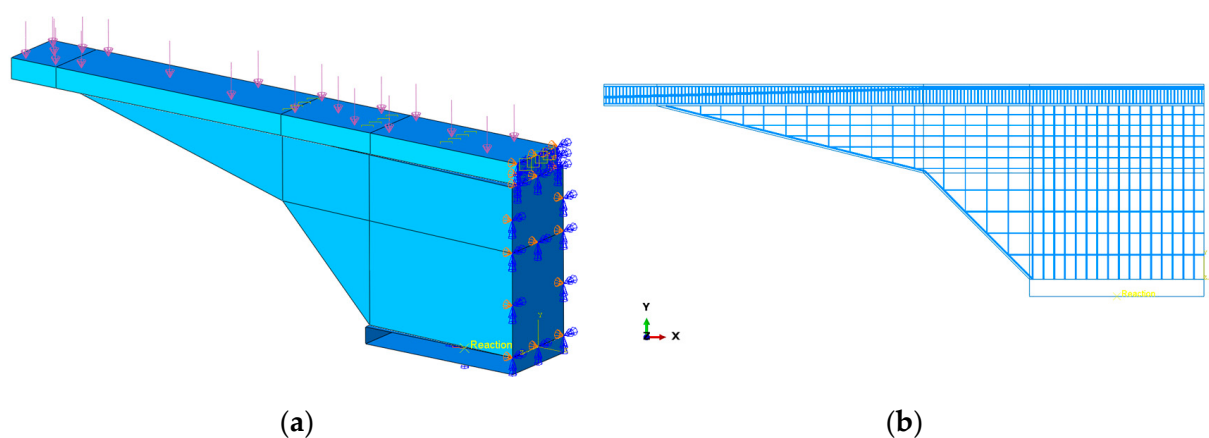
ABAQUS model of half of a column wall: (a) geometry and boundary conditions; (b) steel cage arrangement.
